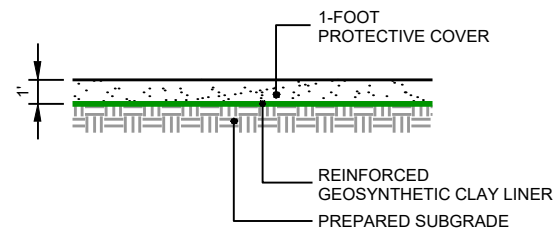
CROSS SECTION OF EMBANKMENT
